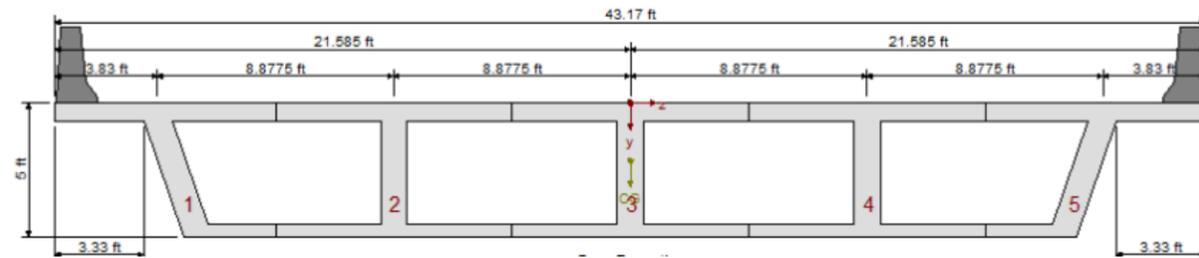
Bridges on SR303 over existing canals, 2C-22 and 2C23- Typical Section
